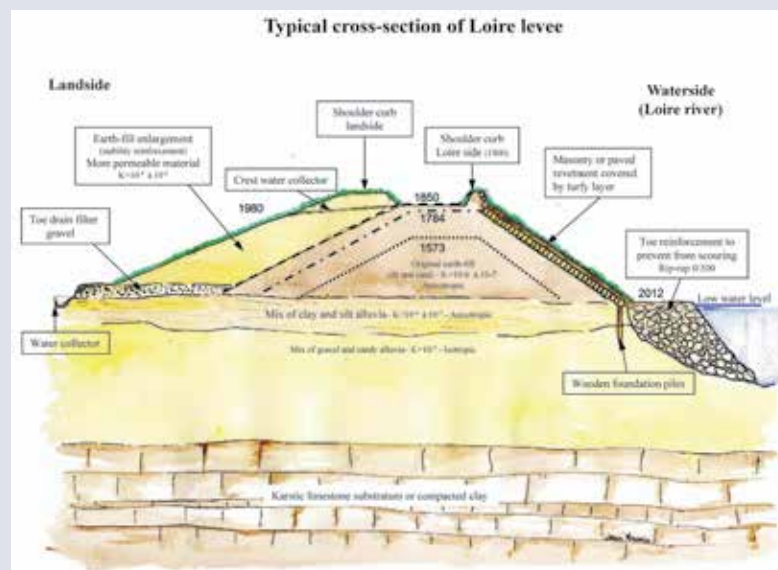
Typical cross-section of a Loire levee today (courtesy J Maurin)
